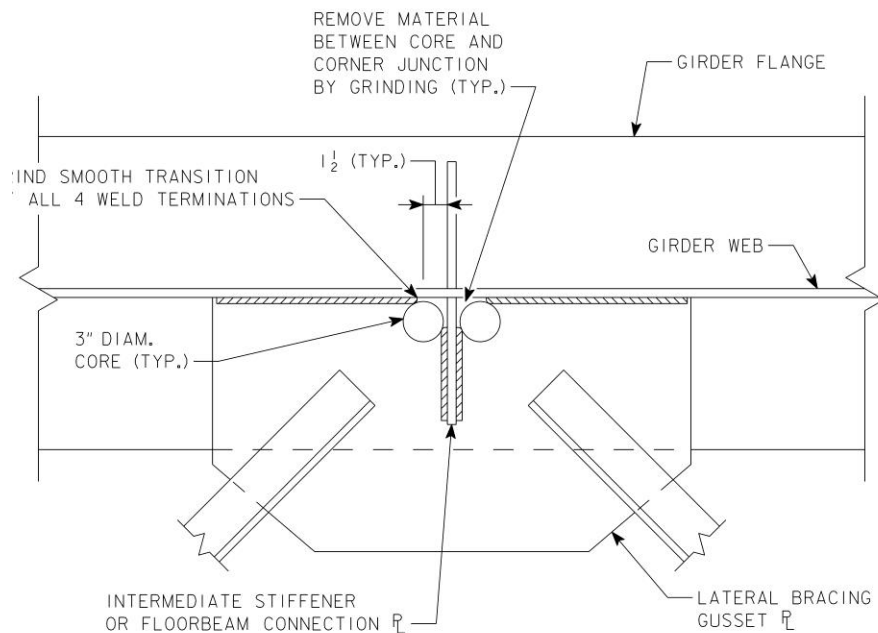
Lateral Bracing Gusset Plate Fatigue Crack Retrofit
